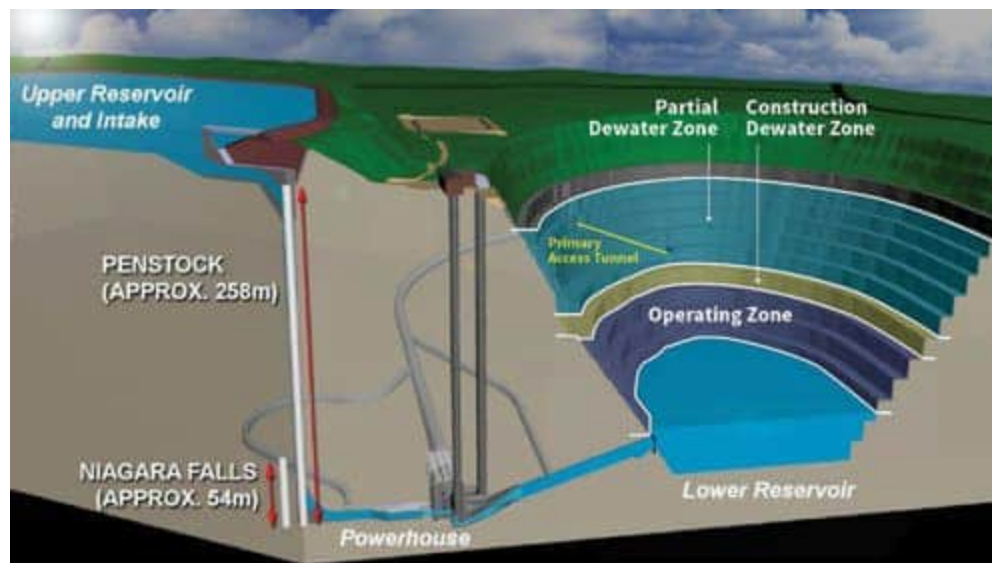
Main Components of the Pumped Storage Facility (Open Pit Primary Access Tunnel Configuration)
